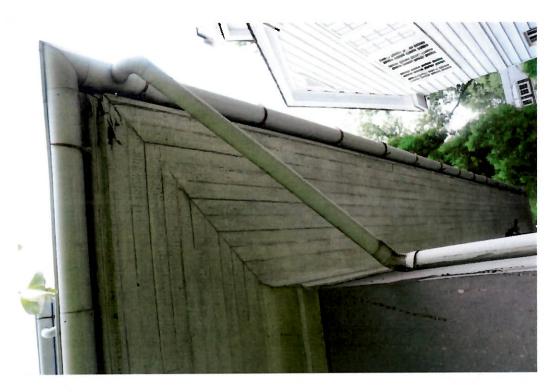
08/05/19. Side (west). Project area. Detail of wood ceiling, trim, and molding to be repaired and painted; stucco to be repaired and painted; aluminum gutters and downspouts to be repaired.
